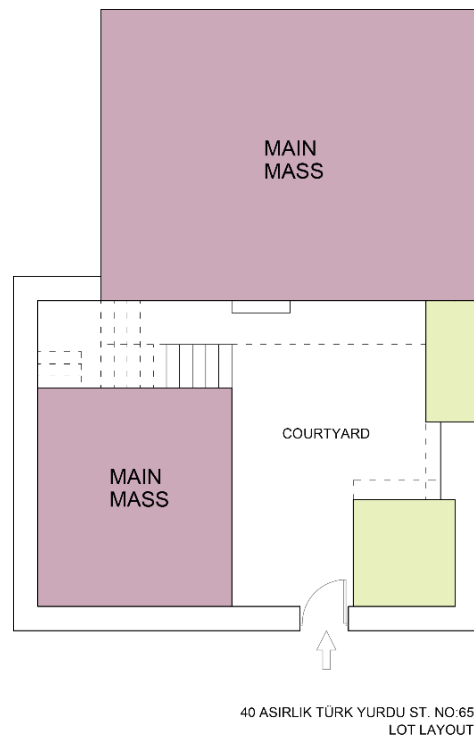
The lot layout of 40 Asırlık-65 House (Author, 2023)
